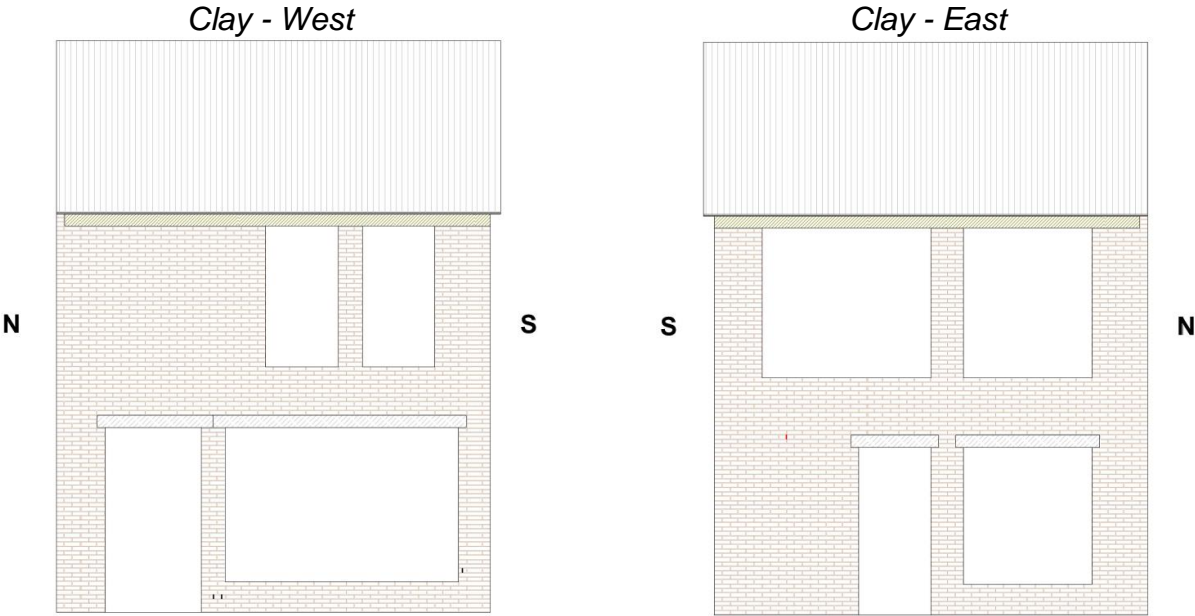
EQ-NPR 20% cracks – West and East clay façades.
